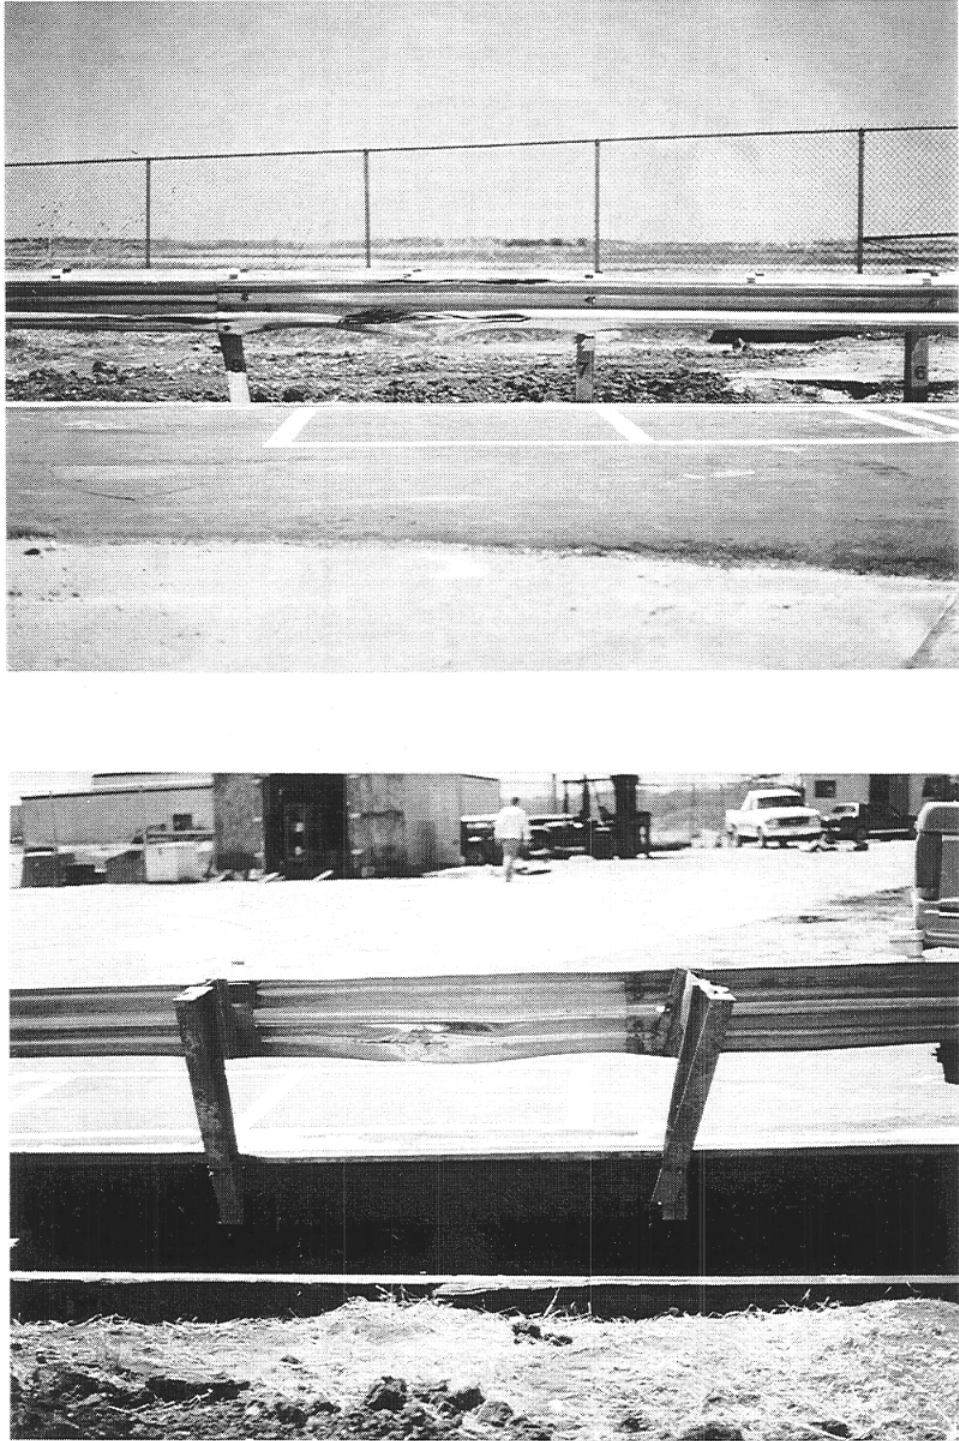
Bridge Rail Damage, Test LVBR-3
